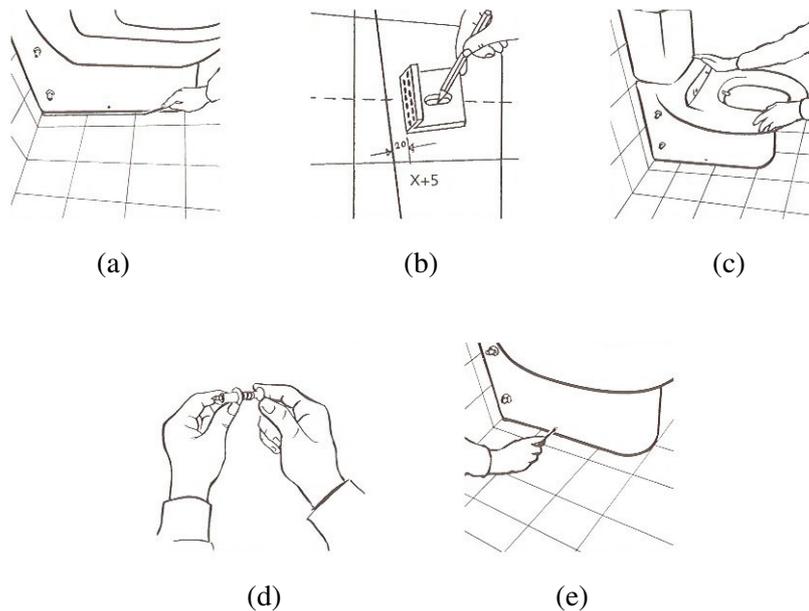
Assembly of WC pan back to wall with cistern, if the assembly kit is fastened from sides, (a) Closet placed temporarily, the bottom edge and the assembly holes signed on the floor, (b) Assembly apparatus placed to x (bottom edge thickness)+5 mm from end and front sides and the holes signed, (c) Closet placed with the cistern taking attention to the edge line signed on the floor, (d) Plastic joint fasten to the screw, (e) Screws with joints placed in the holes to fix the closet to the floor (Vitra Ceramic Sanitaryware Technical Catalogue, 2003)
